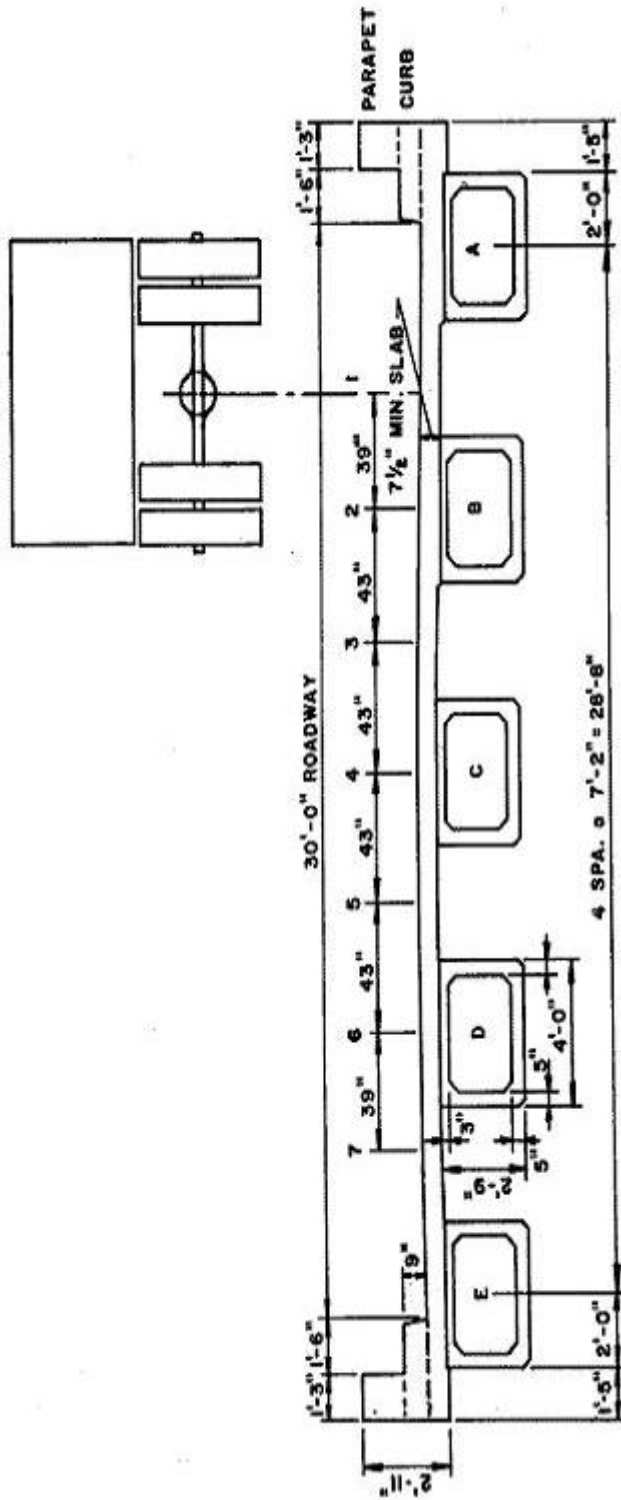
Cross-section of Derherville Bridge and Centerlines of Loading Lanes (Douglas 1966)
